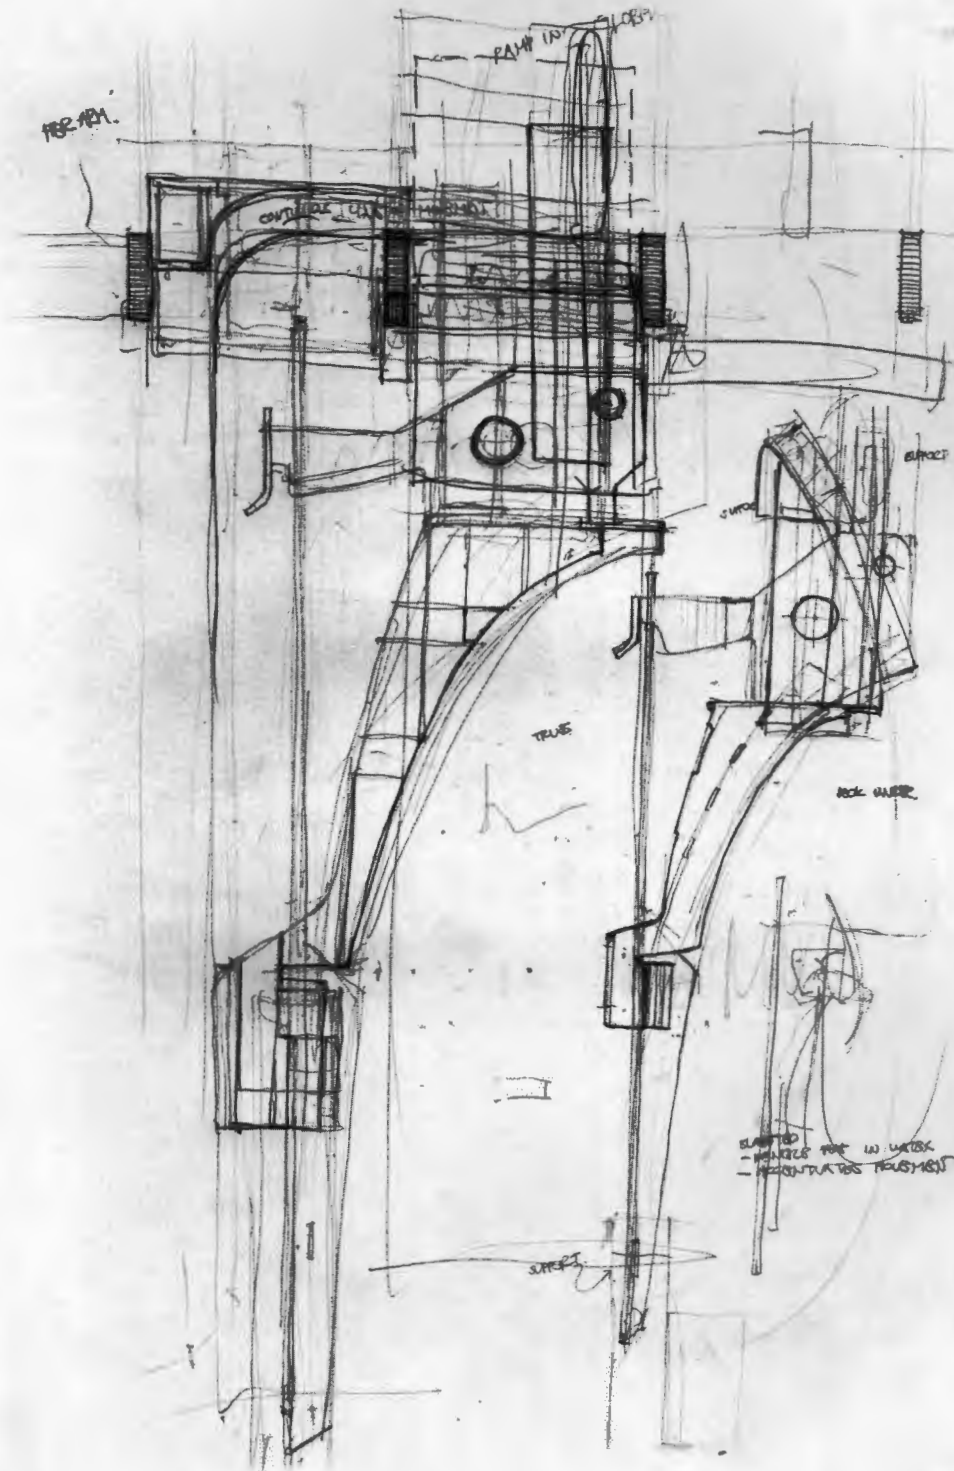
Studies for Pier. These drawings are interpretations of a model partly built from found objects (obtained from scrapyards, see fig. 18). Through drawing, a metal machine component becomes a pier for the Mariner's Guesthouse.
